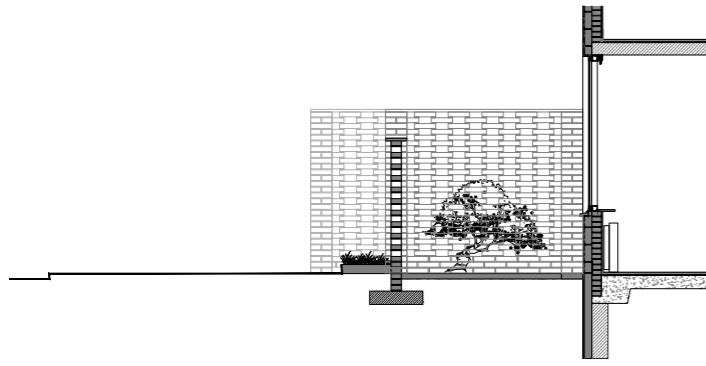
entrance of ground-floor one-bay house as a buffer zone between public and private
